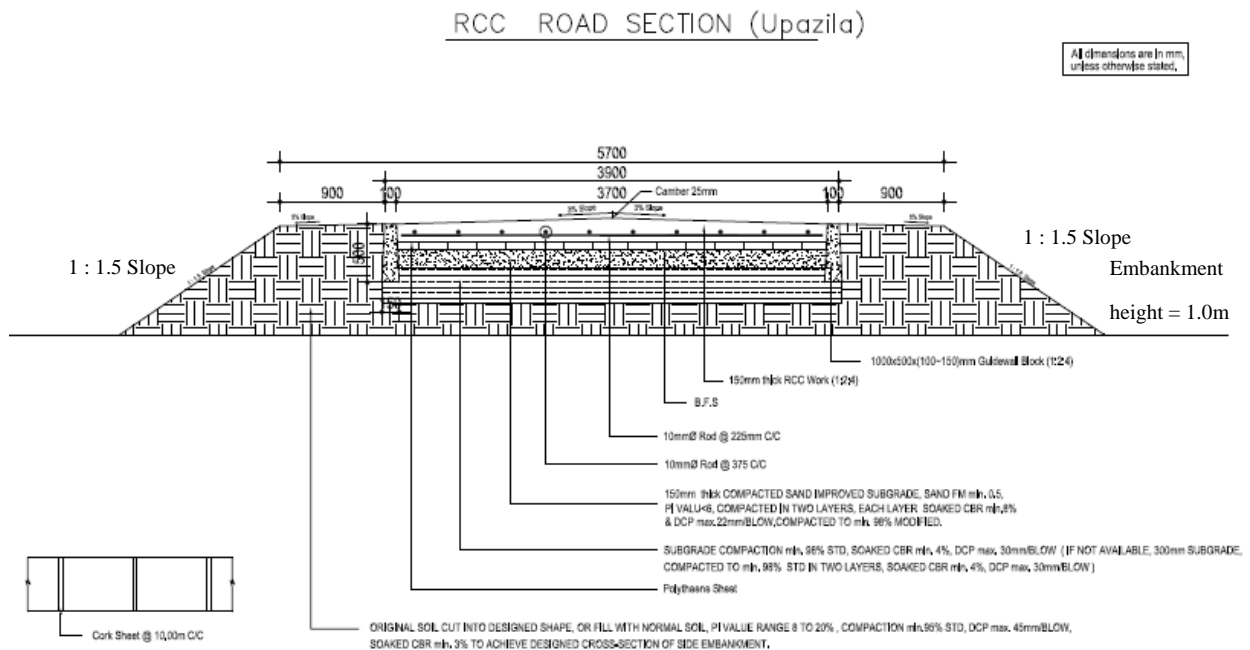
RCC Road Section (Submerged) (Upazila Road)
